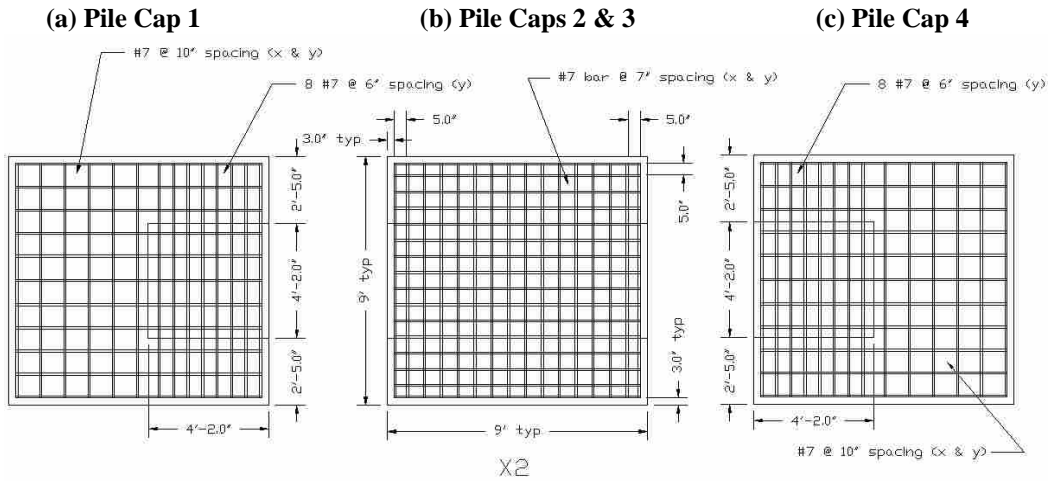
Layout of top reinforcing mat for the test pile groups.
